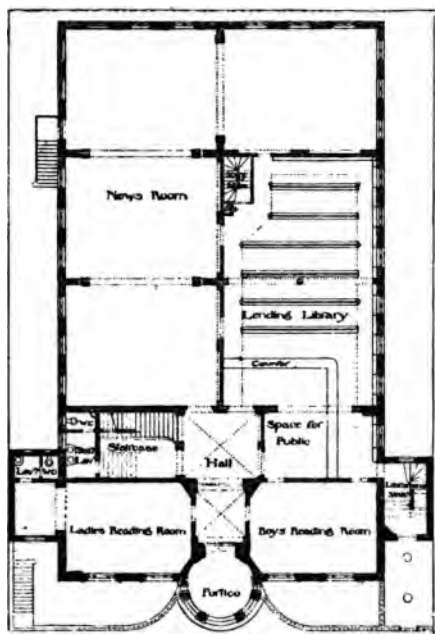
Plan of ground floor of the Chelsea Central Library.
